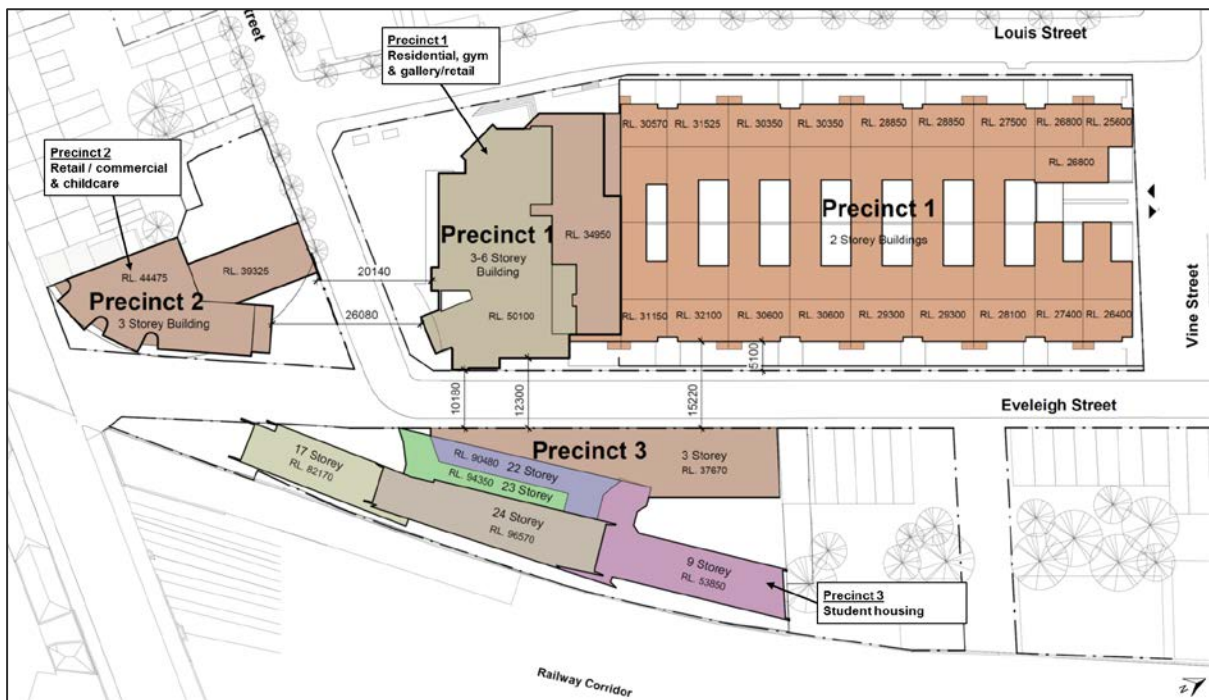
| Proposed modified concept building envelope heights (Base source: Applicant's RtS)
